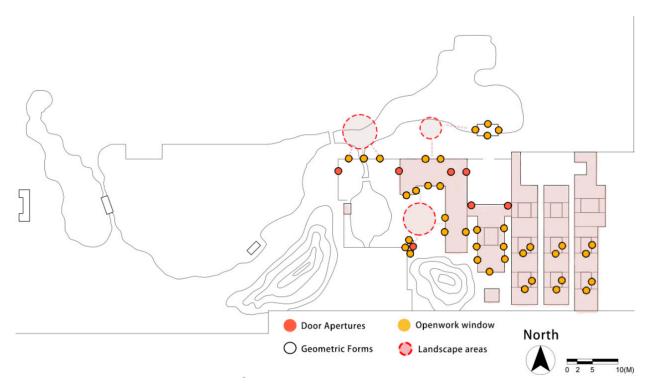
Location and distribution of permeable-type doors and windows in Liang Garden (source: authors).
